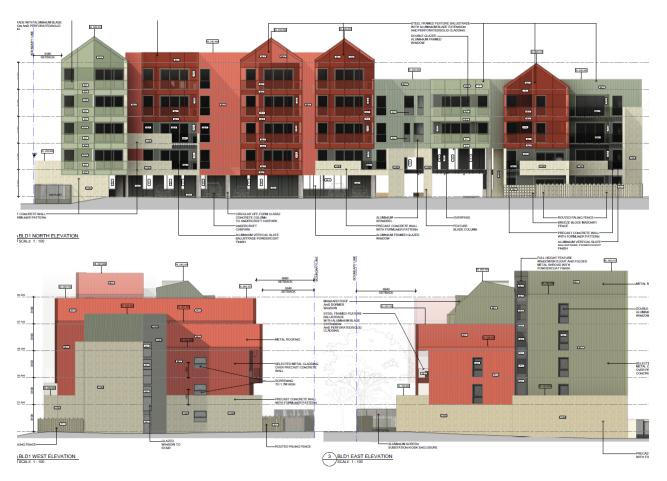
North, west and east elevations of Building 1 of the proposed St Andrew's Bendigo Housing Development.
